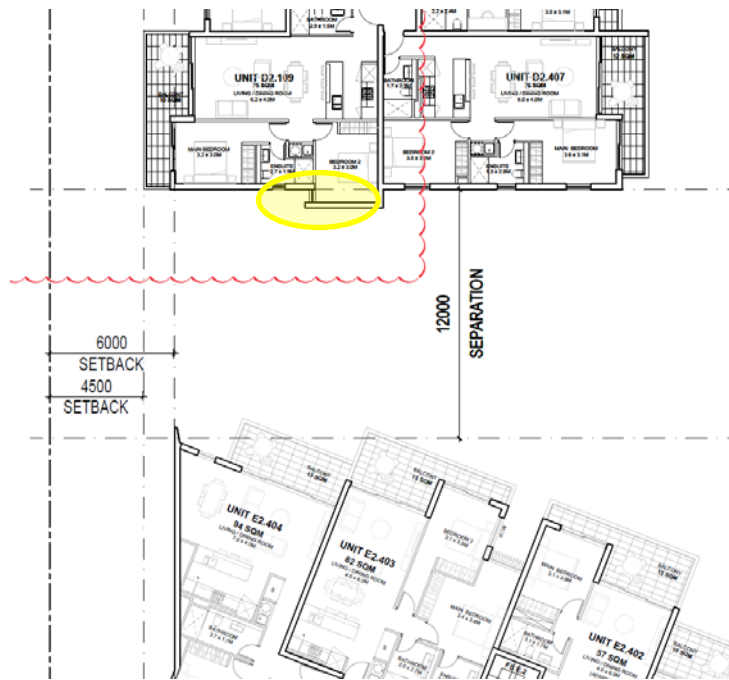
Extract of the Building D and E Level 4 Plan, Drawing No. DA 1205, showing a building separation of only 10 m between balconies and habitable rooms. The Applicant has provided some angled bedroom windows (highlighted in yellow) to assist with protecting visual privacy (Source: PBD Architects)
